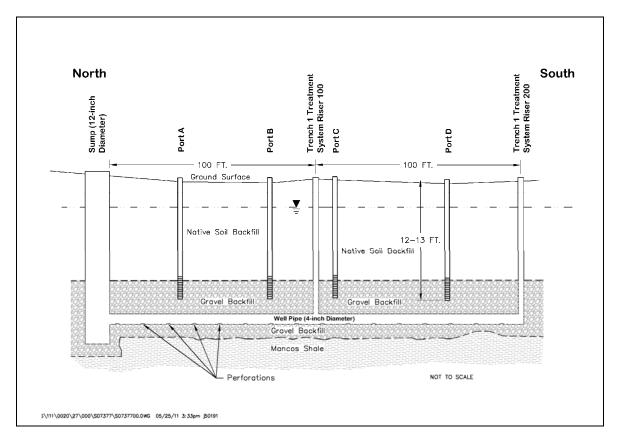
Cross-Section View of the Trench 1 Collection Drain
